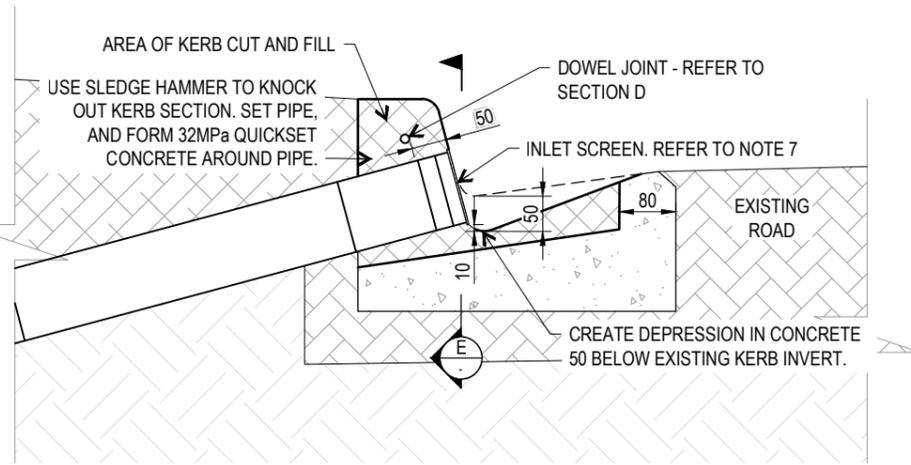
TYPE 'E' (BARRIER) KERB INLET
